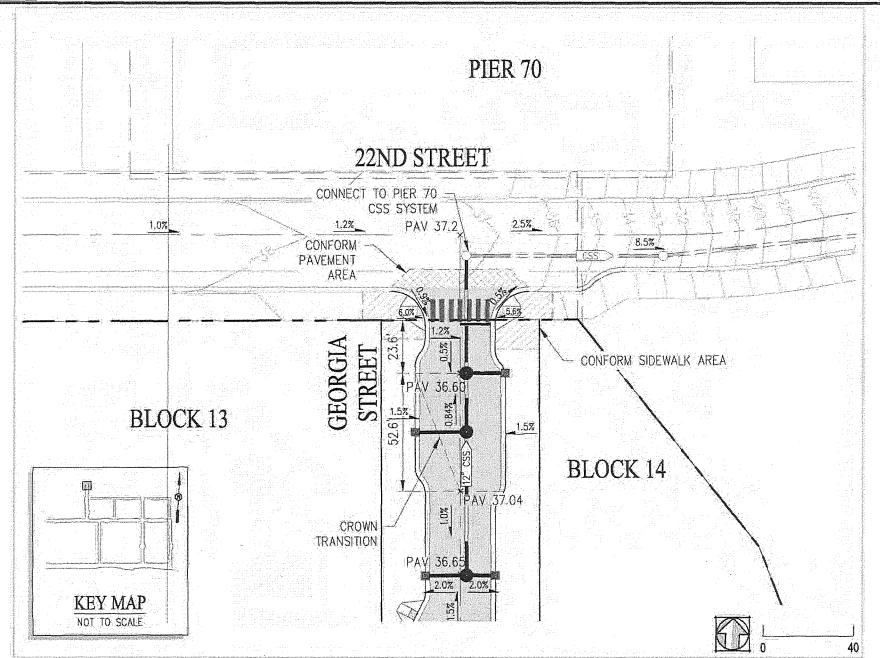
22nd Street & Georgia Street Intersection Preliminary Grading
